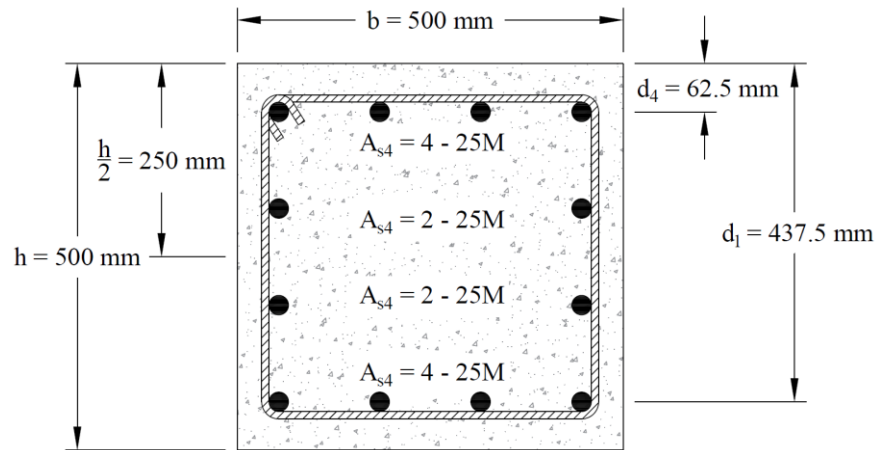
Slender Reinforced Concrete Column Cross-Section
